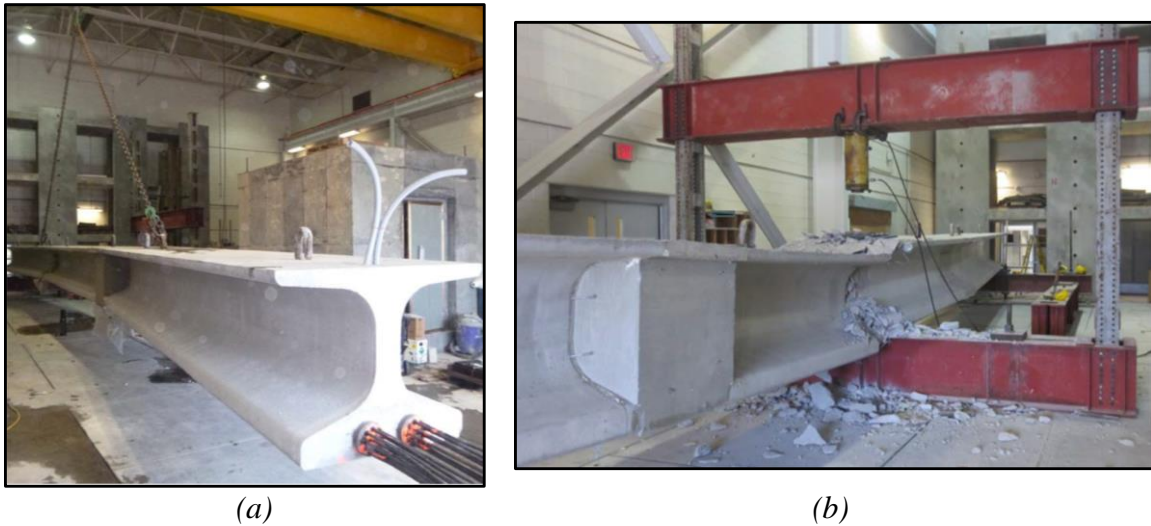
I-girder test specimen with two splice regions – (a) during lifting; (b) after failure (from Alawneh, 2013)
